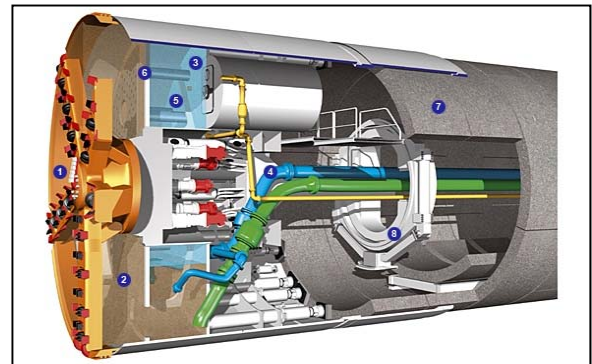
Typical Slurry-Face TBM with Precast Segment Lining
